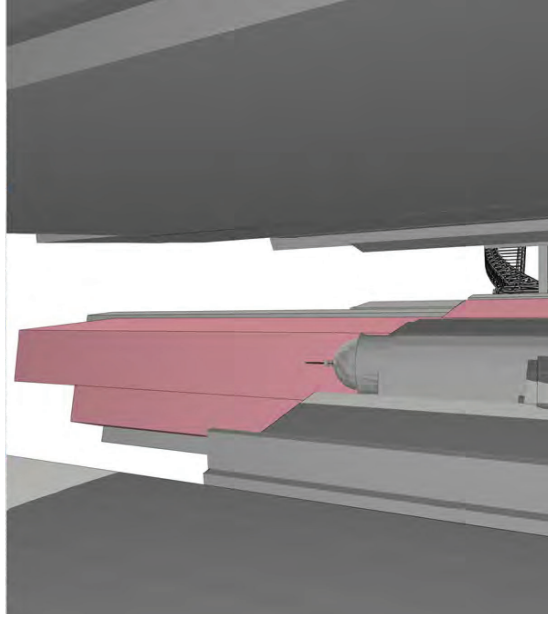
View 1 Pitt St Looking North - Proposed Envelope
